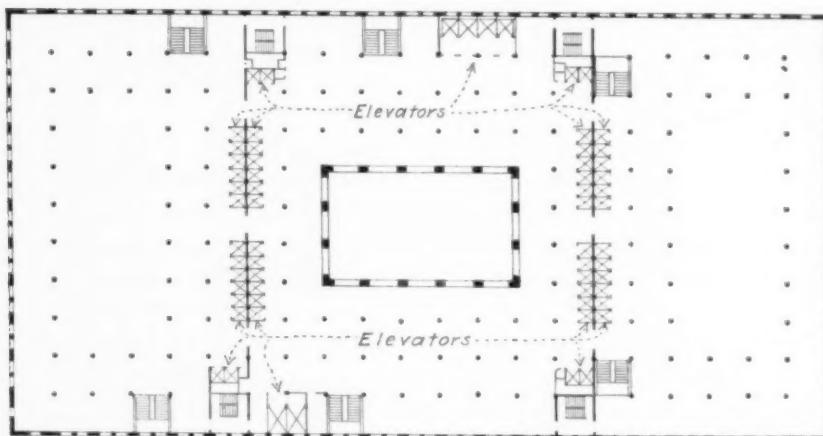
DEPARTMENT STORE FLOOR PLAN SHOWING PRESENT ARRANGEMENT OF FIRE WALLS, ELEVATORS AND STAIRS
